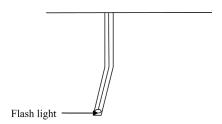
Flashlight is lowered to the bottom of the pile.
